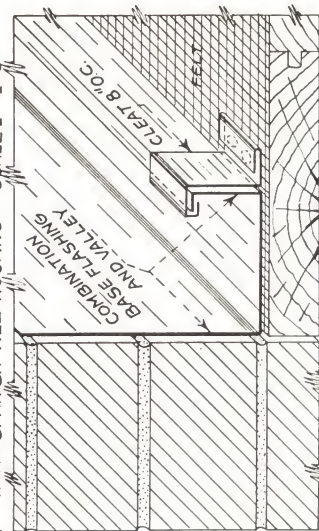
DETAIL SHOWING METHOD OF SECURING BASE FLASHING VALLEY - SCALE 3"=1'-0"
